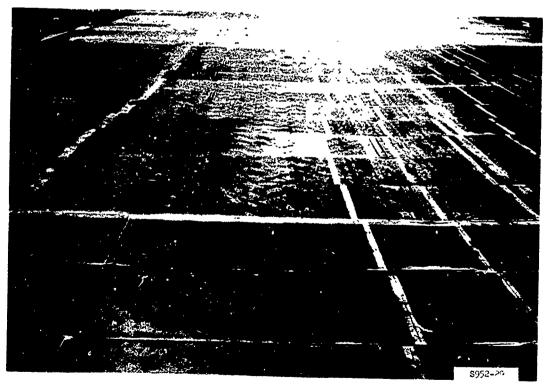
Test section III, lane 2, item 2, after failure at 72 coverages
